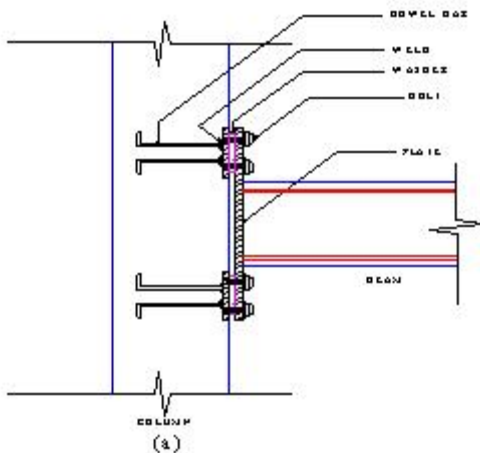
Connection without stiffener between precast reinforced concrete beam and cast-in-situ column in prefabricated building frames.
